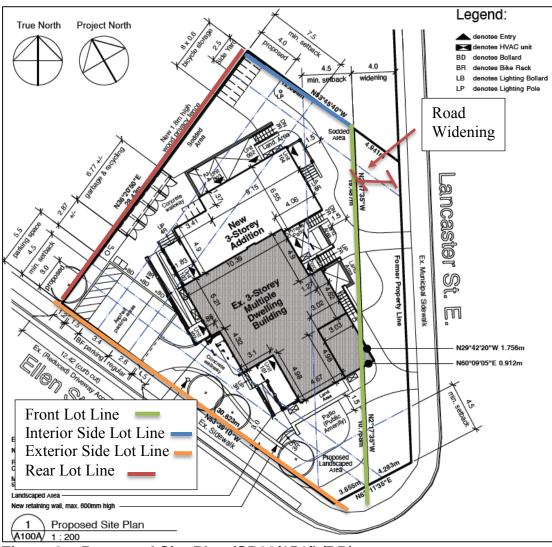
Proposed Site Plan (SP22/154/L/BB)
